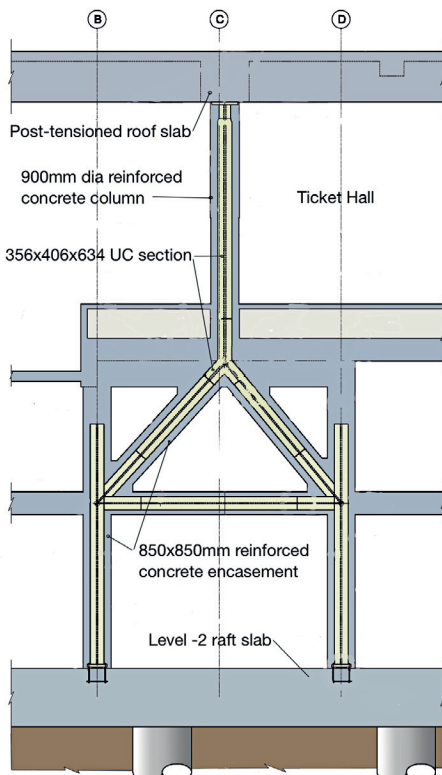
Concrete-encased steel transfer trusses above eastbound platform
